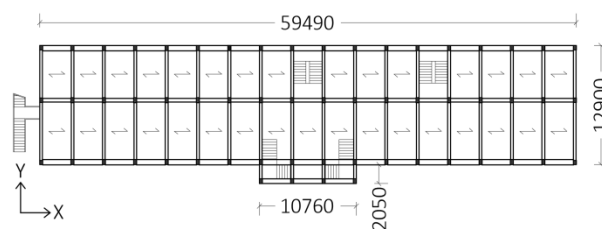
Structural plan of the above-ground storeys (dimensions in mm)
